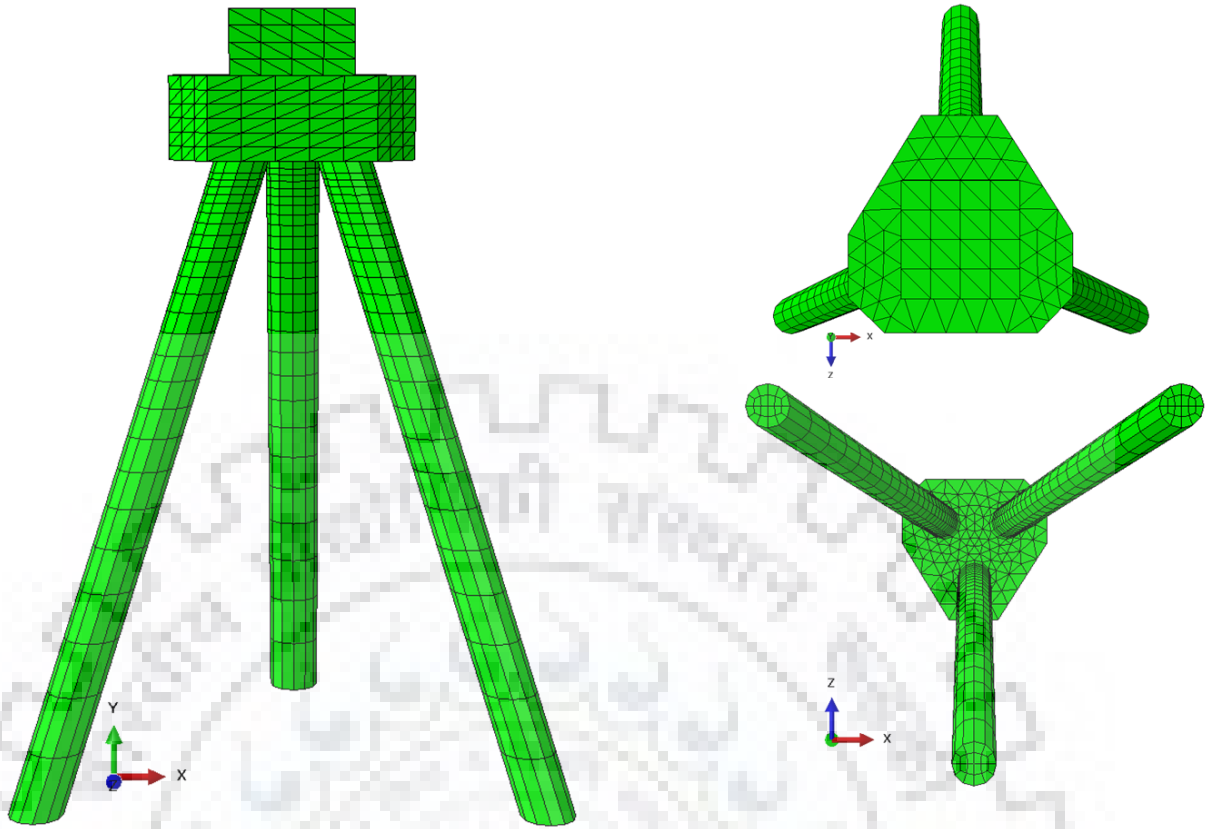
Pile group with cap and machine assembly for 3BG
